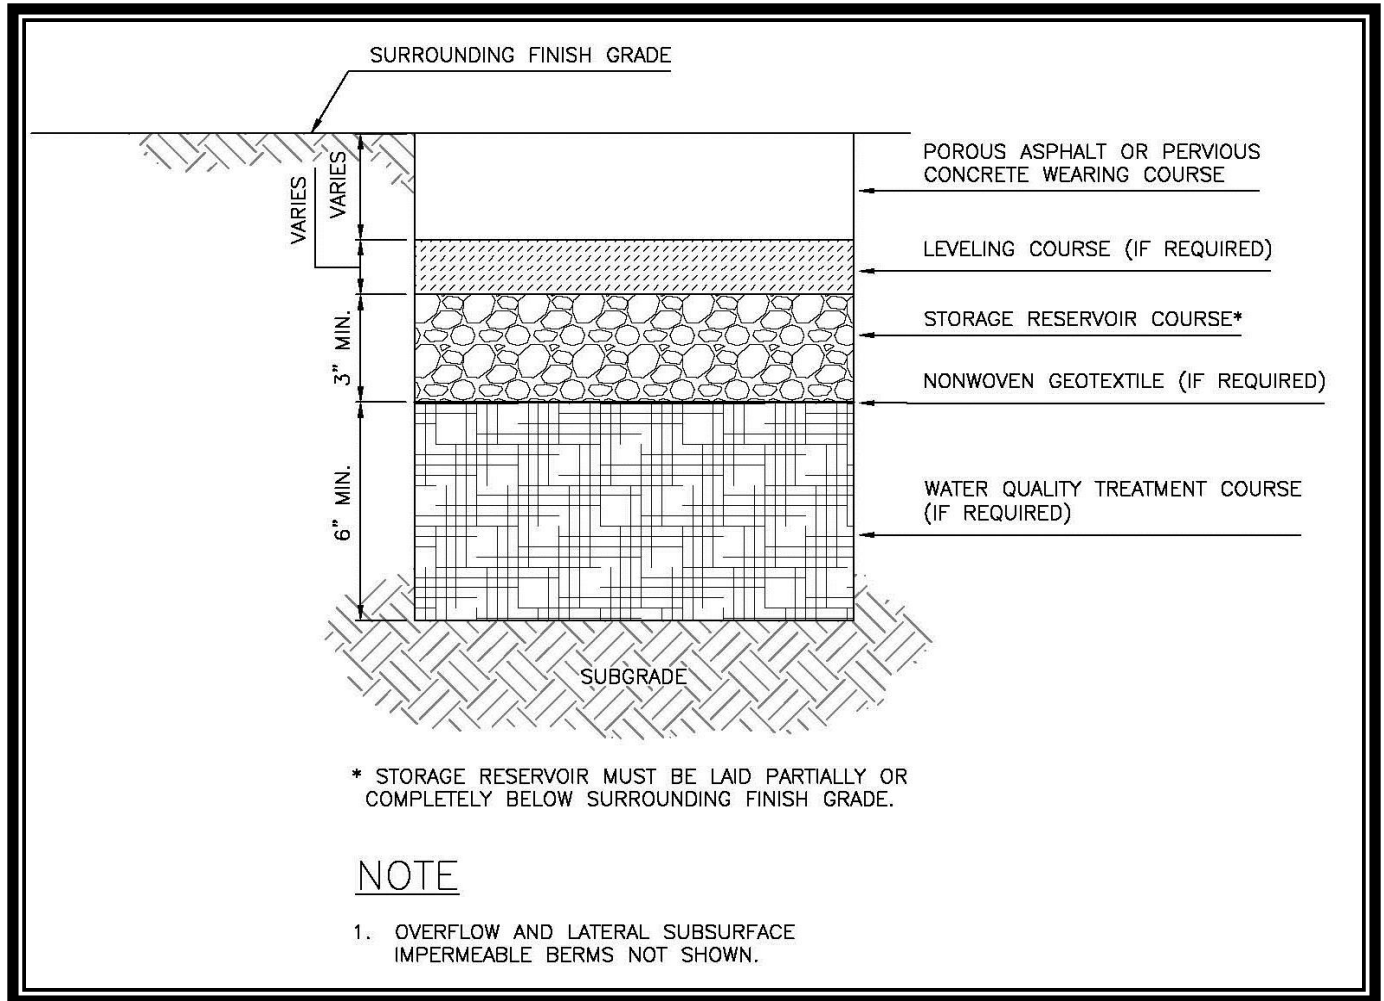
Porous Asphalt or Pervious Concrete Section
